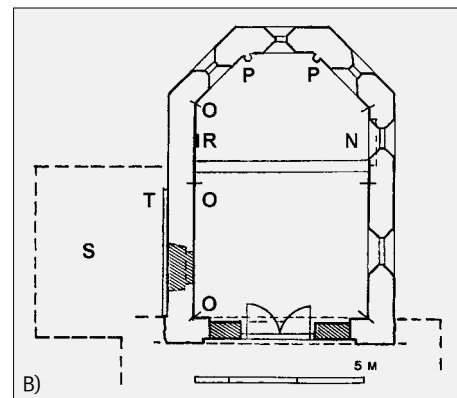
DUBRAVA, FORMER CHURCH, NOWADY A GRAVEYARD CHAPEL:
